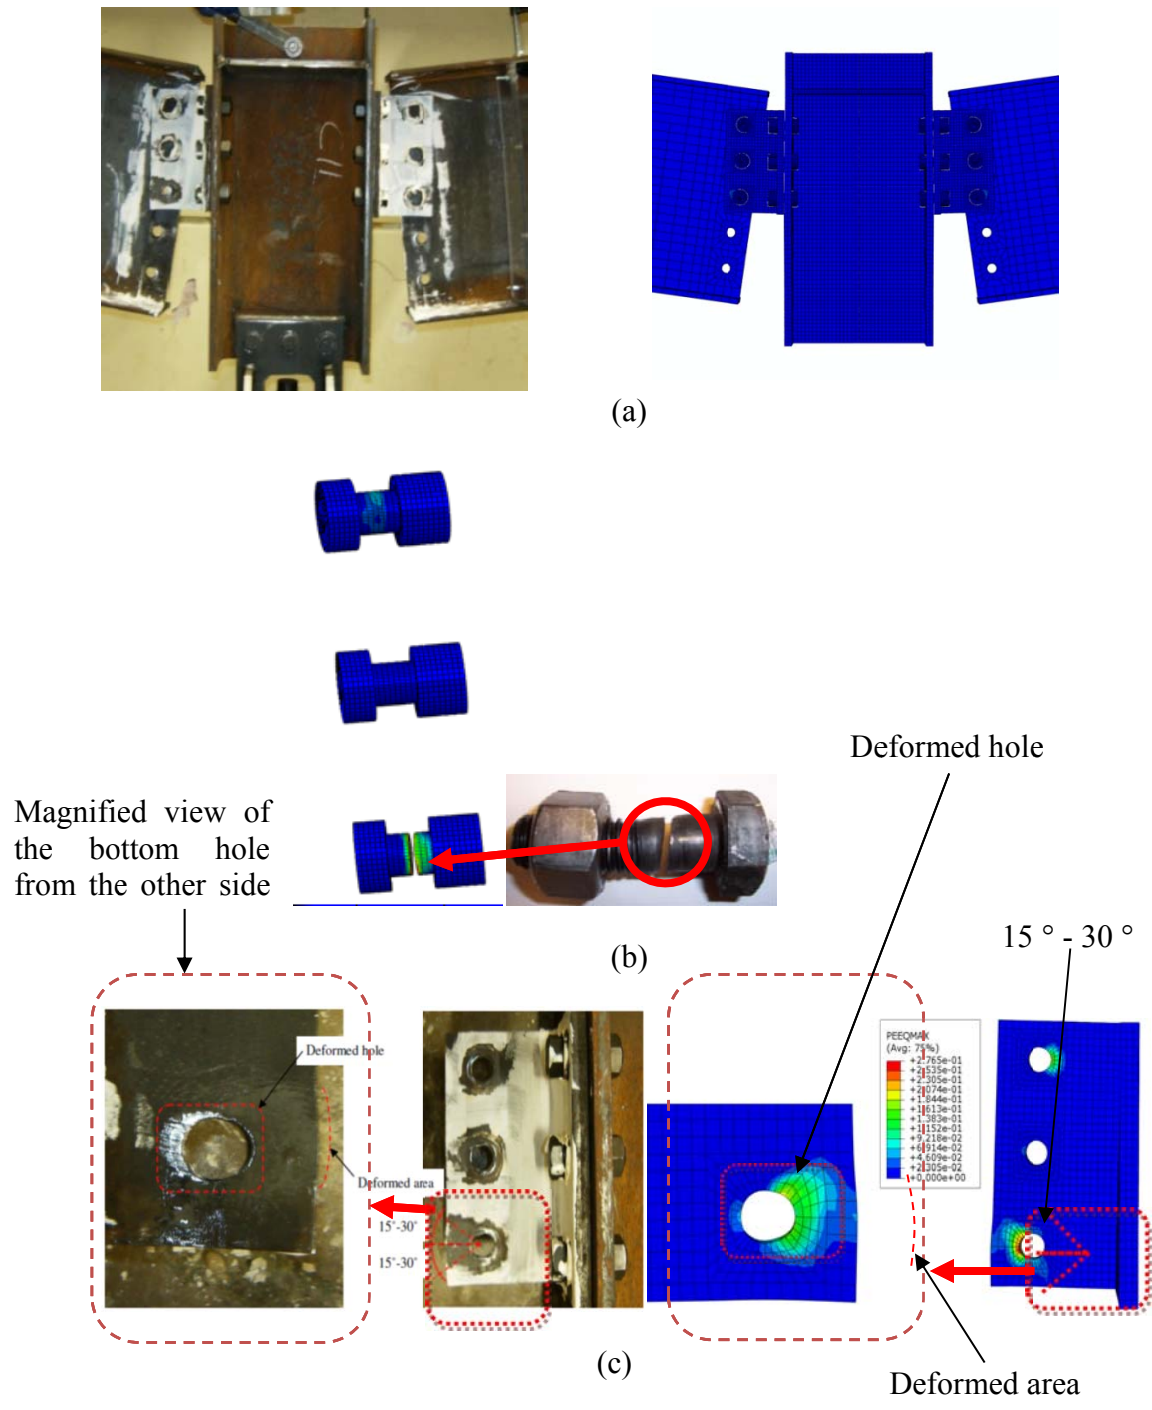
Failure of 3WT, experimental (Friedman 2009) and numerical results: (a) deformed shape (b) bolt rupture (c) bottom hole bearing deformation
